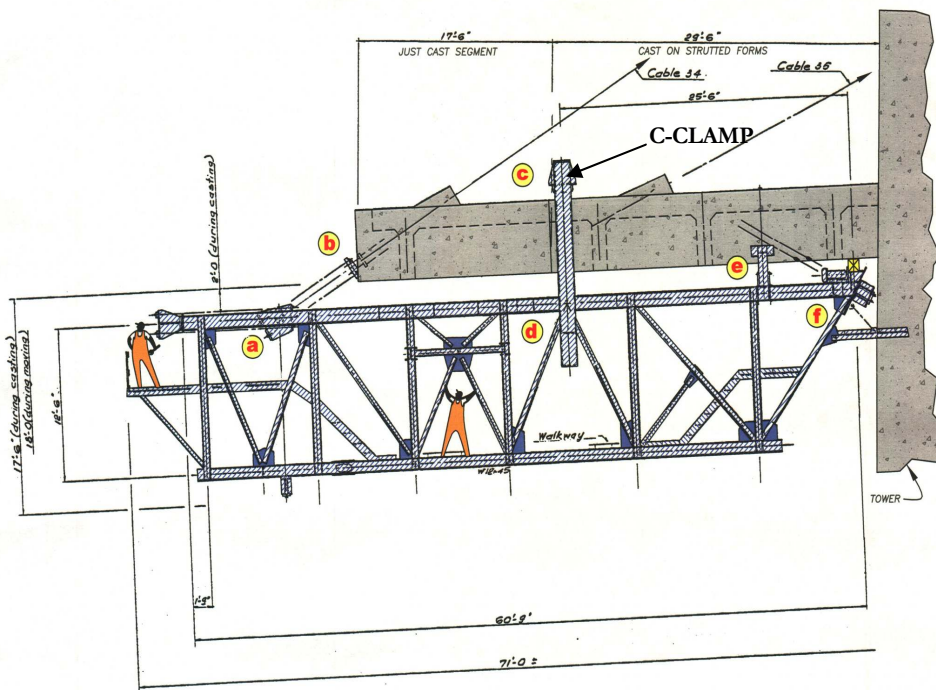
ELEVATION, SIDE SPAN, STARTER SEGMENT
